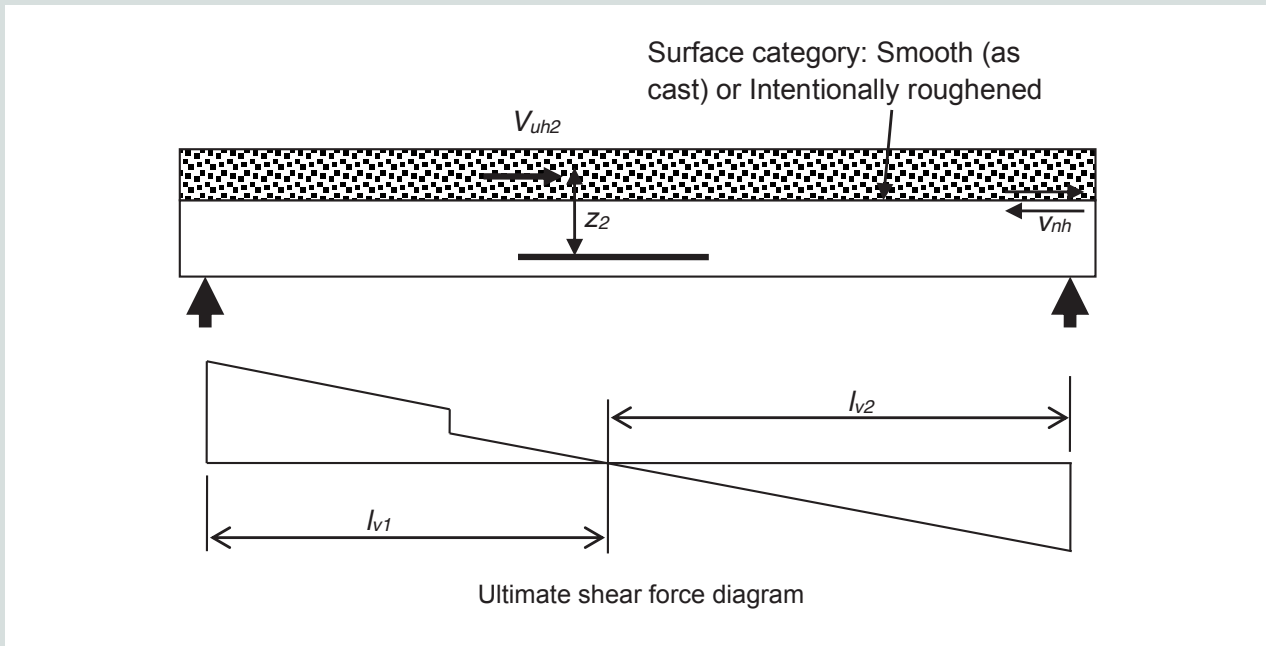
Definitions used in the calculation for interface shear in American Concrete Institute's *Building Code Requirements for Structural Concrete* (ACI 318). Note: l_{v1} = distance to zero shear force from left end support; l_{v2} = distance to zero shear force from right end support; v_{nh} = shear stress; V_{uh2} = horizontal shear force in topping at stage 2; and z_2 = lever arm at stage 2.
